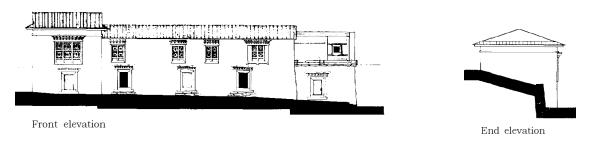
Elevations of a dwelling-house at Phortse. Drawings by Valerio Sestini and Enzo Somigli.
